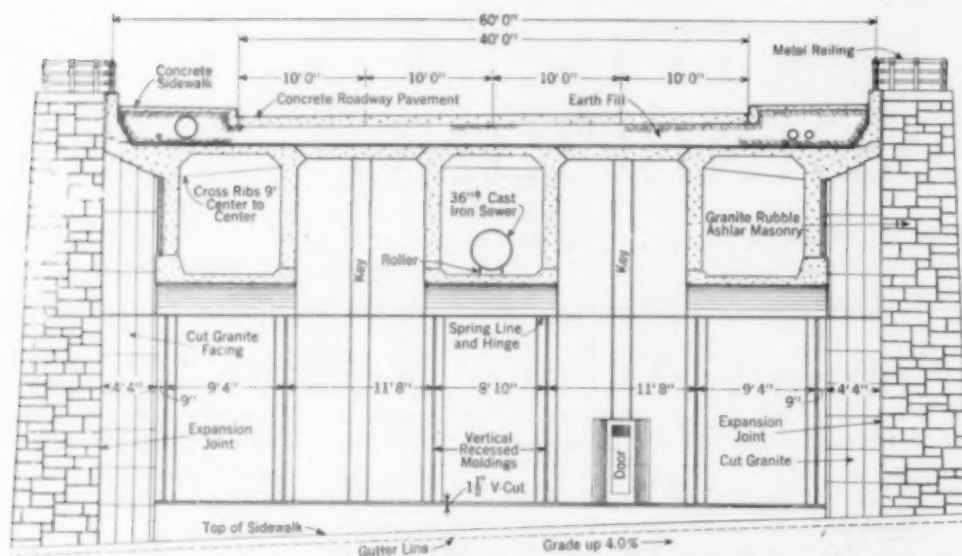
CROSS SECTION OF SUMMIT AVENUE BRIDGE
